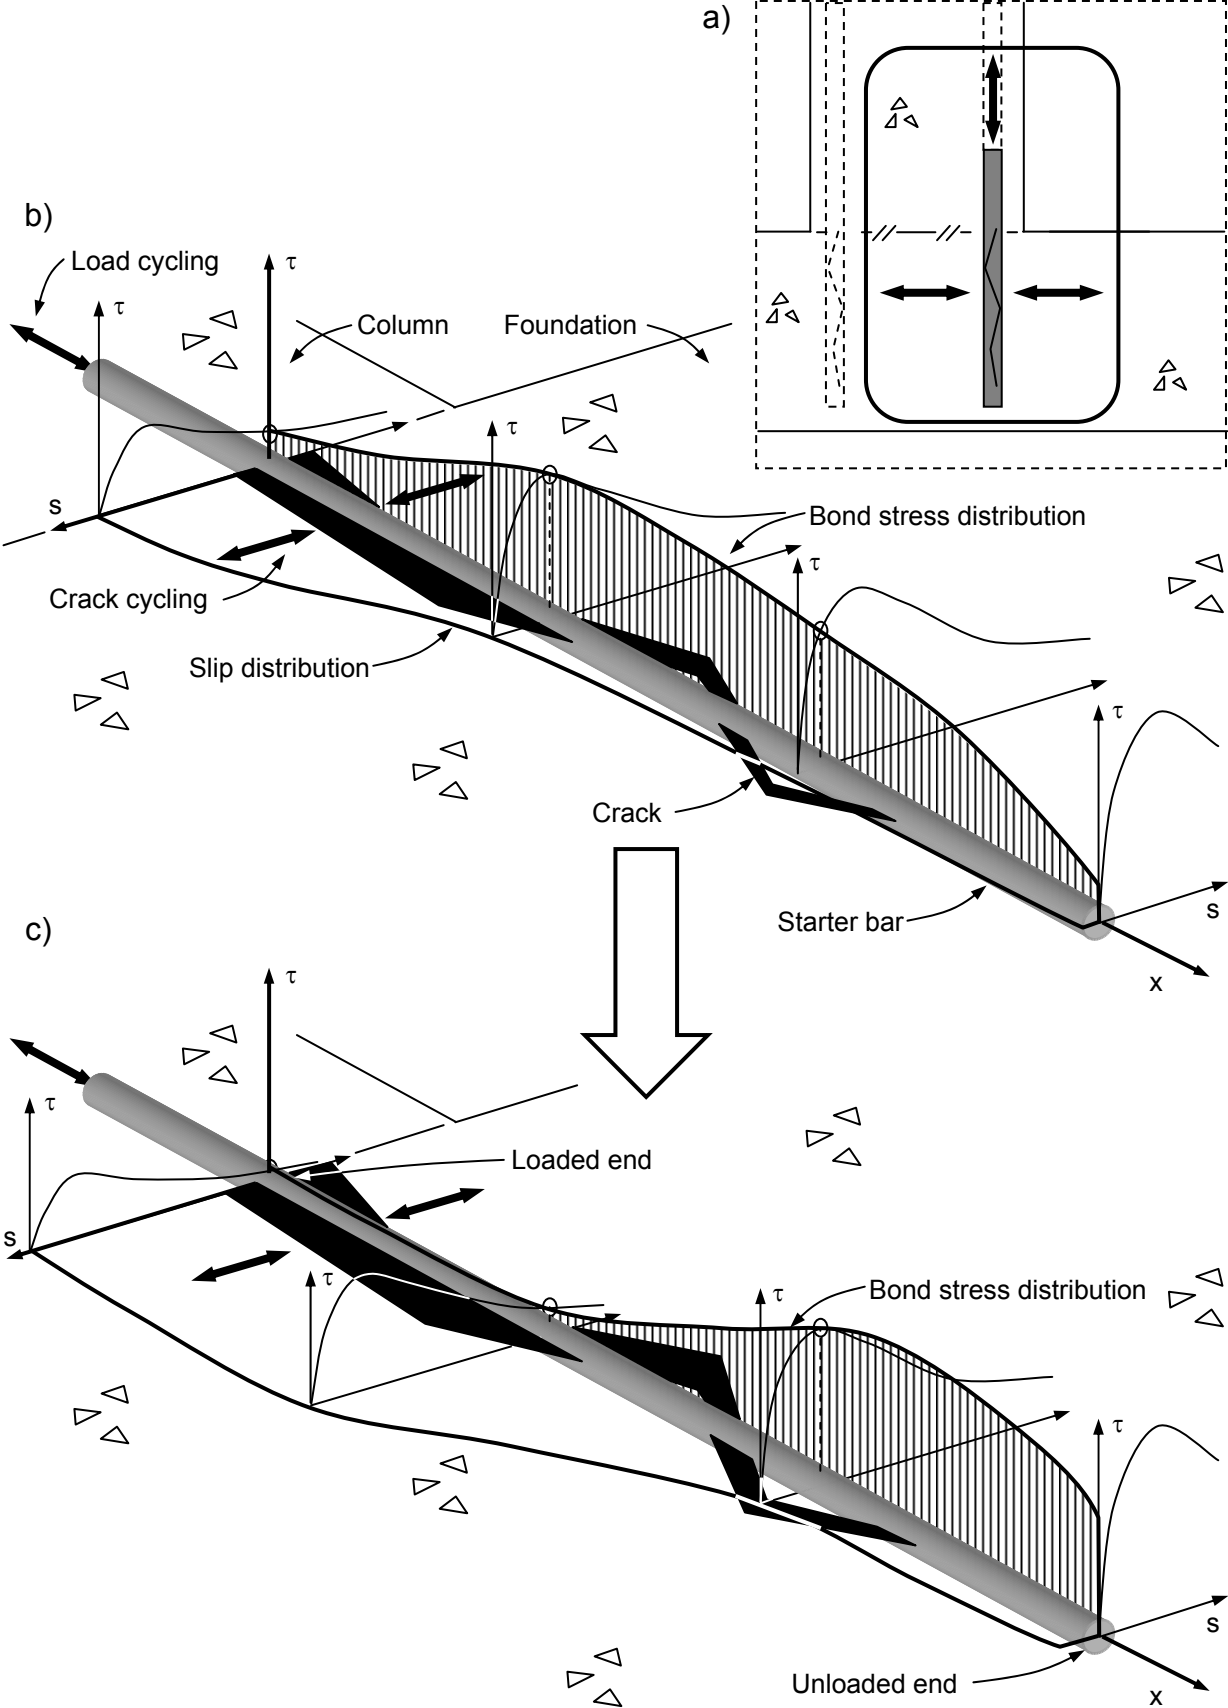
a) Column-to-foundation connection; Isometric view on starter bar anchorage of b) at the beginning of loading and c) after propagated damage, illustrating the redistribution of bond stresses from loaded to unloaded end
